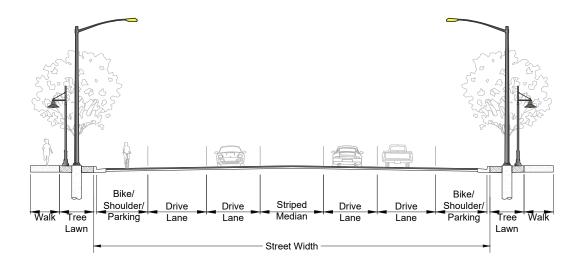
Typical Arterial with Continuous Street and Pedestrian Lighting Cross Section
